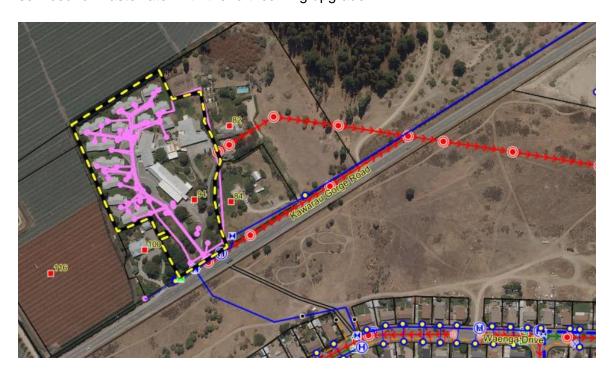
Subject site (outlined in yellow and black) and that adjacent, with pink showing the private stormwater, blue the reticulated water supply and red the reticulated wastewater
